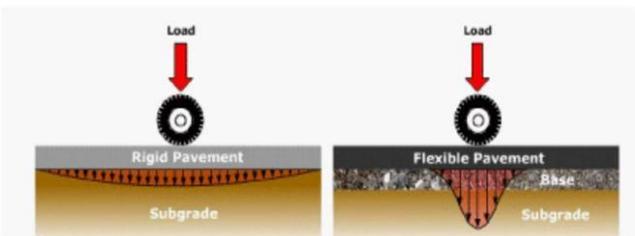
Typical stress distribution under a rigid and a flexible pavement.
